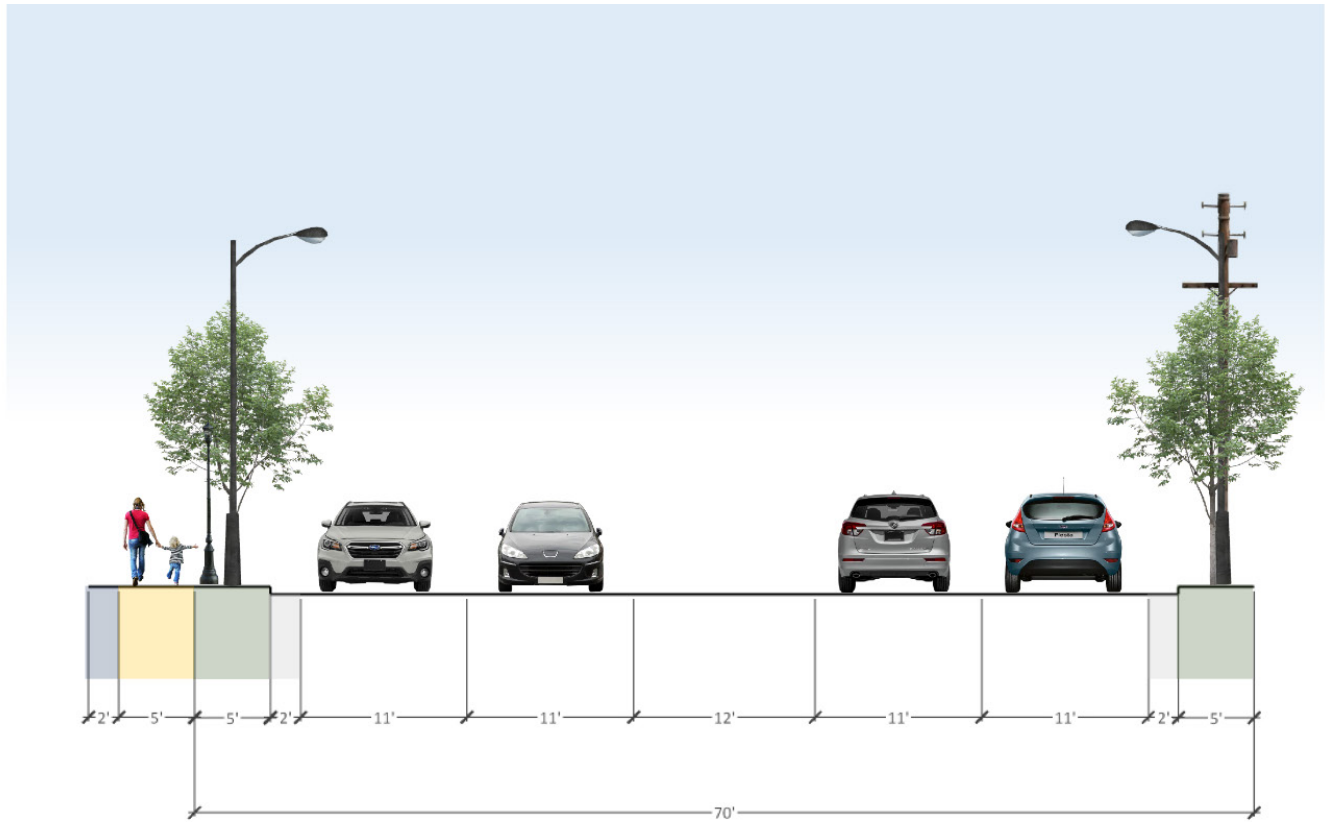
W. Broadway Street Recommended Cross-Sections: Segment 2
